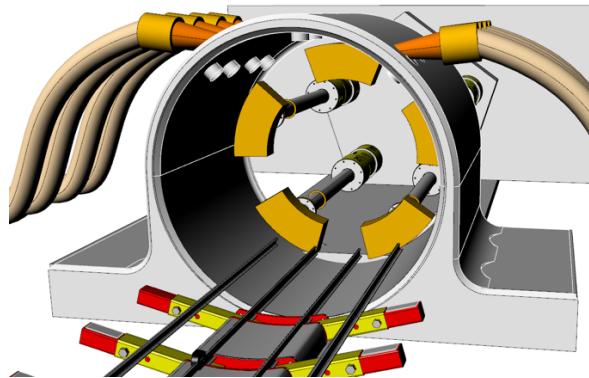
Concrete Eye (grey) with circular arrangement of hydraulic jacks
